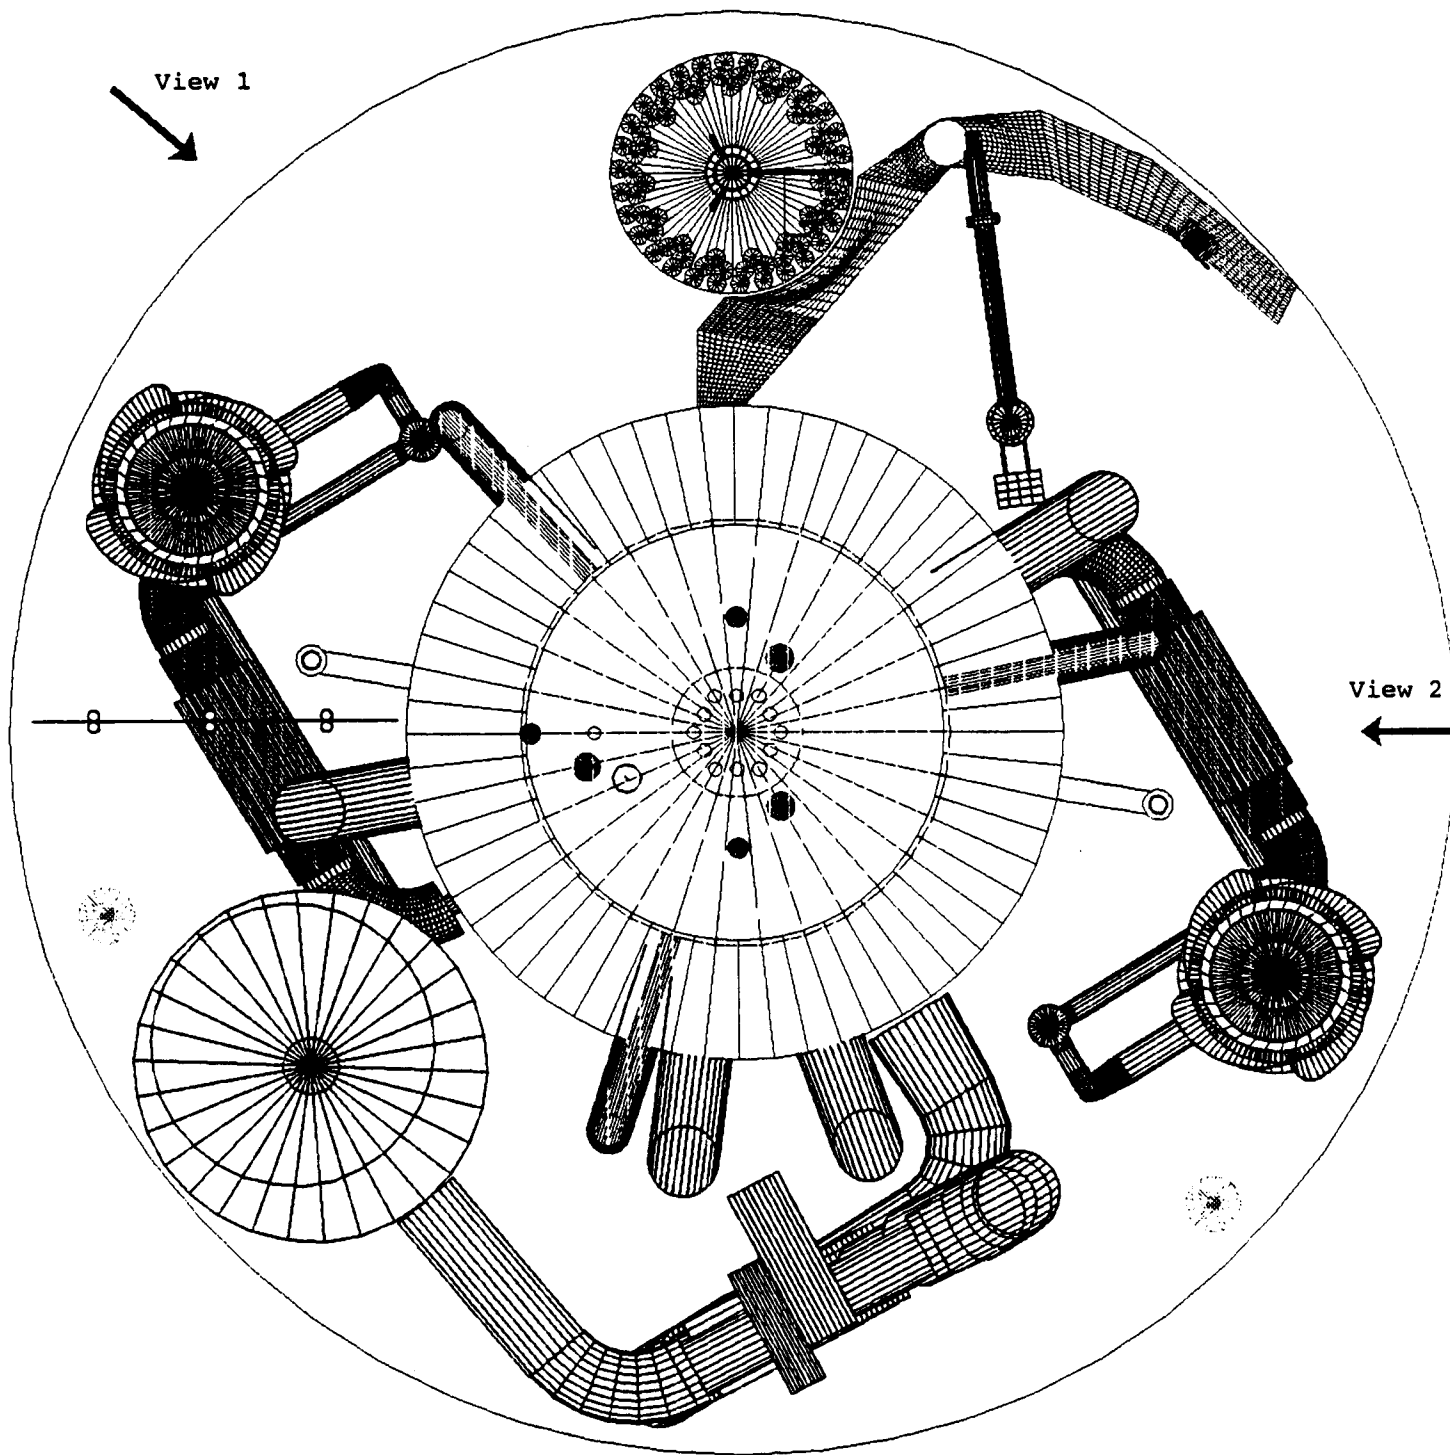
Plan View of the EBR-II Primary Tank, Looking Downward From Sodium Level.
